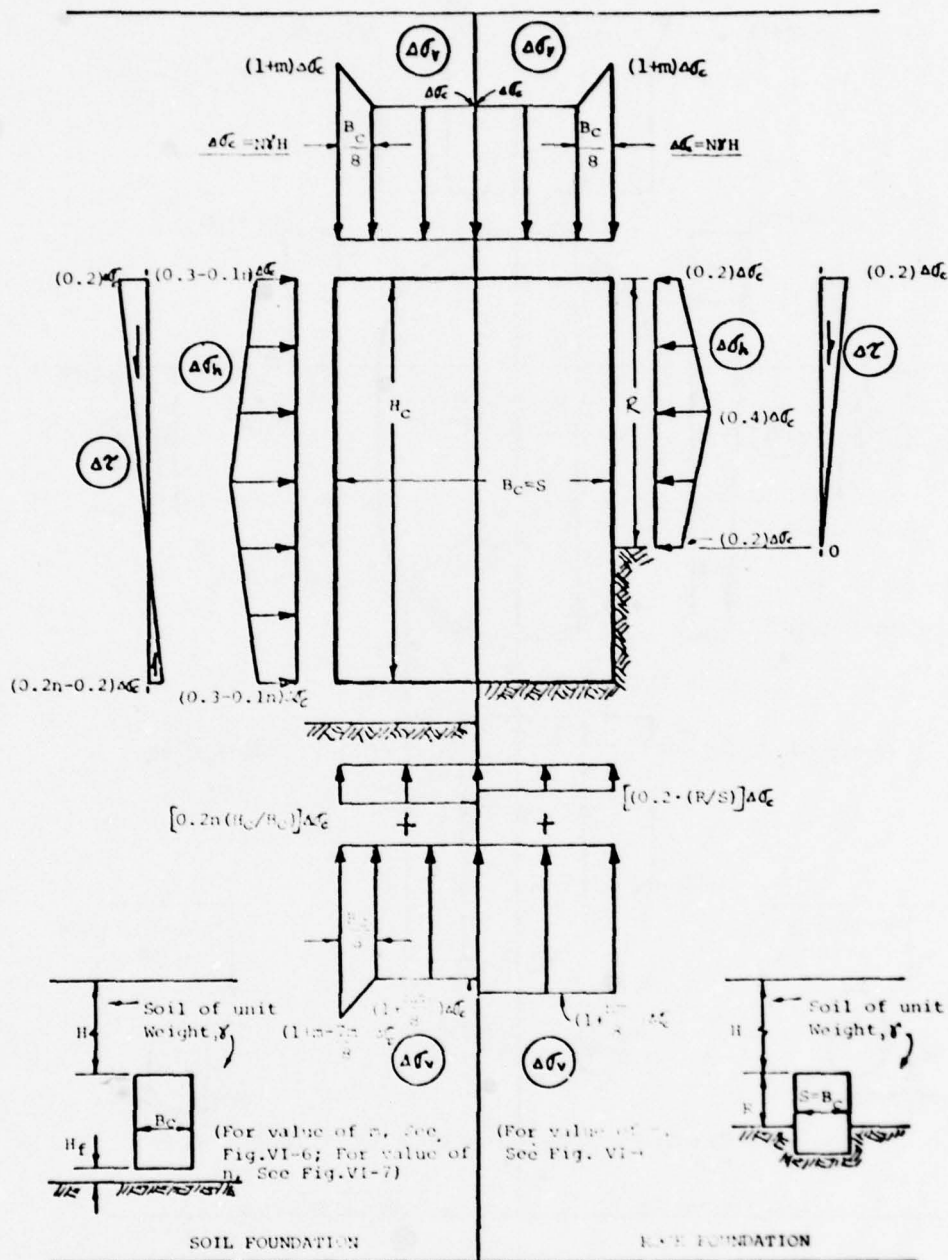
DESIGN EARTH PRESSURES FOR RECTANGULAR CONDUITS, EMBANKMENT CONDITION
